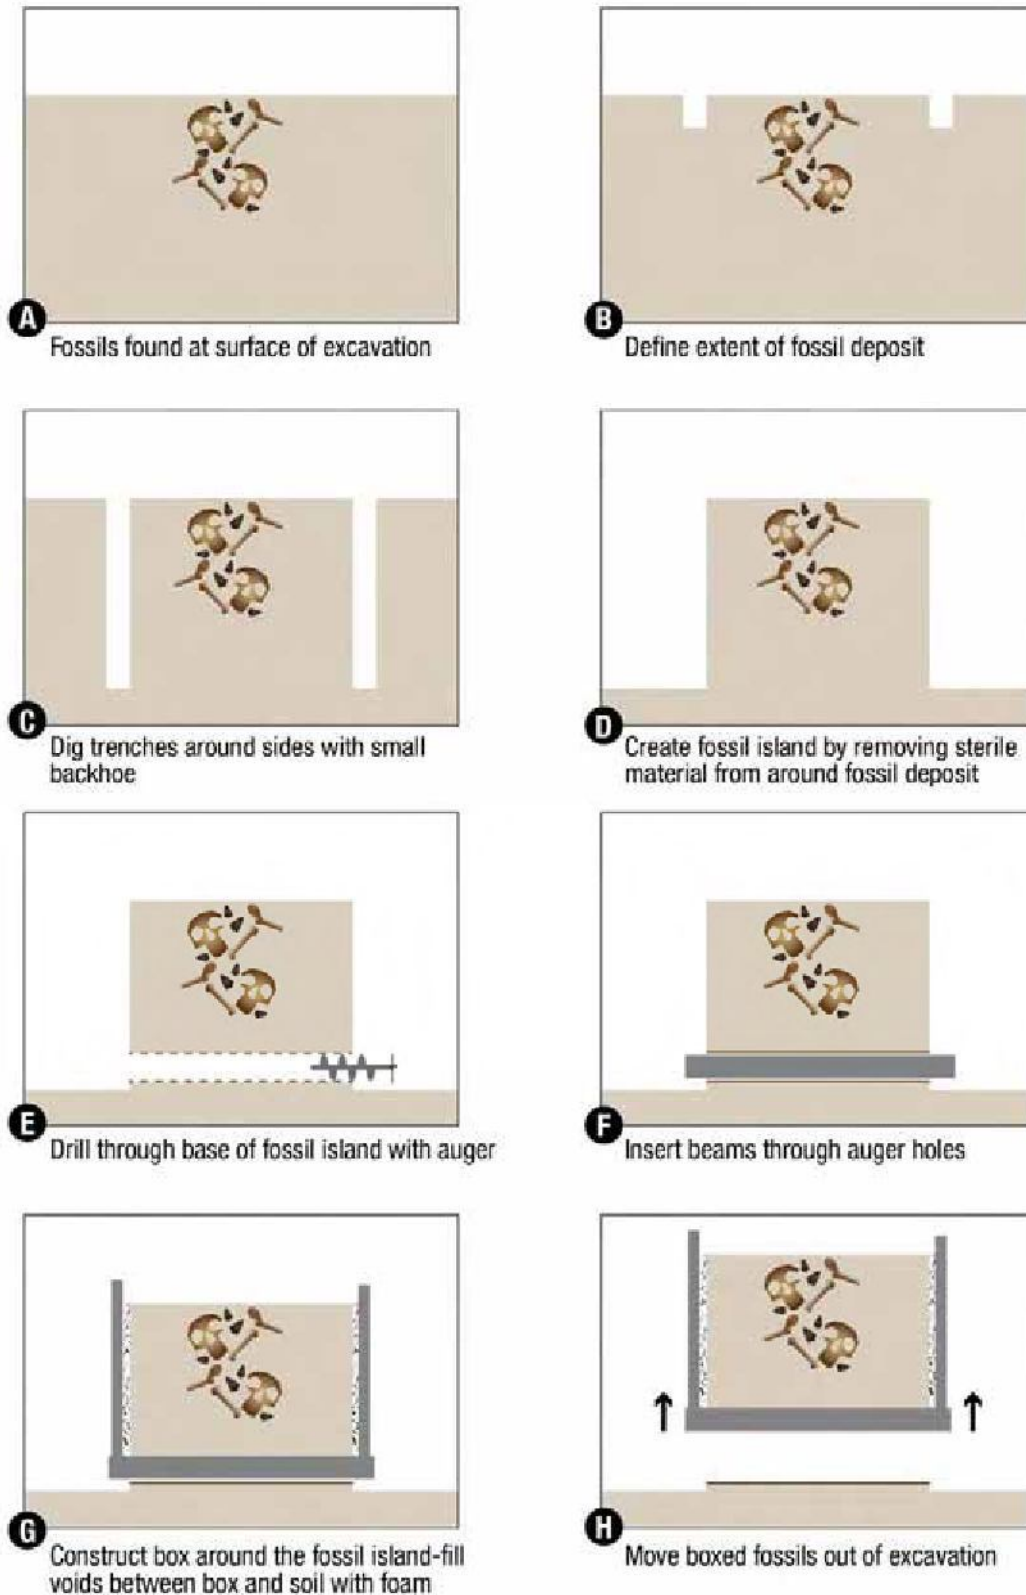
Proposed Alternative Boxing Technique Using Auger for Floor Construction
